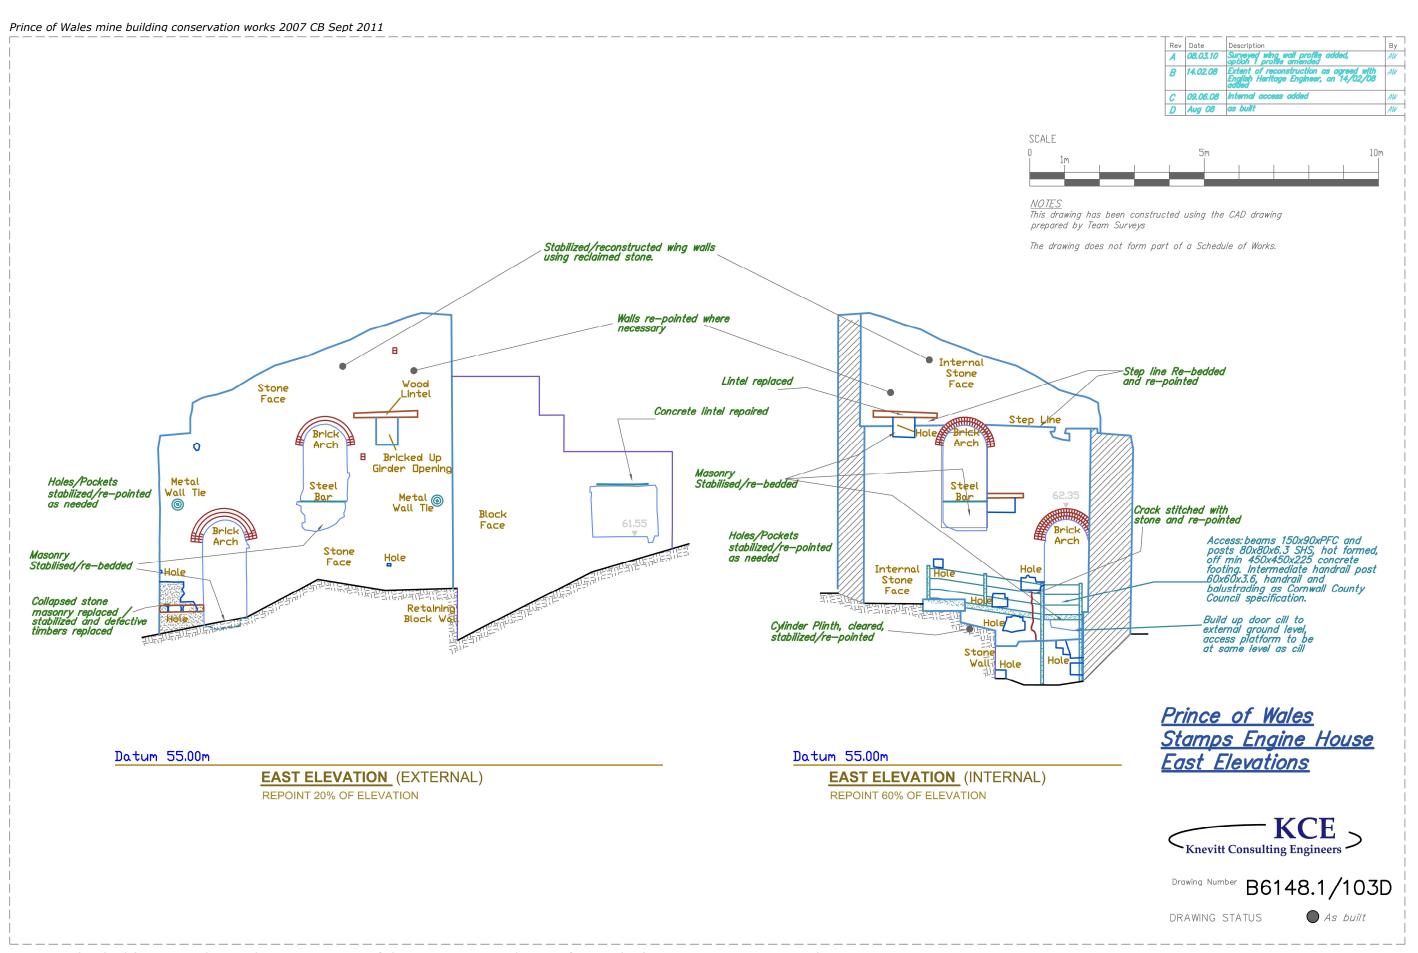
'As built' annotated East elevation surveys of the stamps engine house after works (Knevitt Cons. Engs. 2008)
